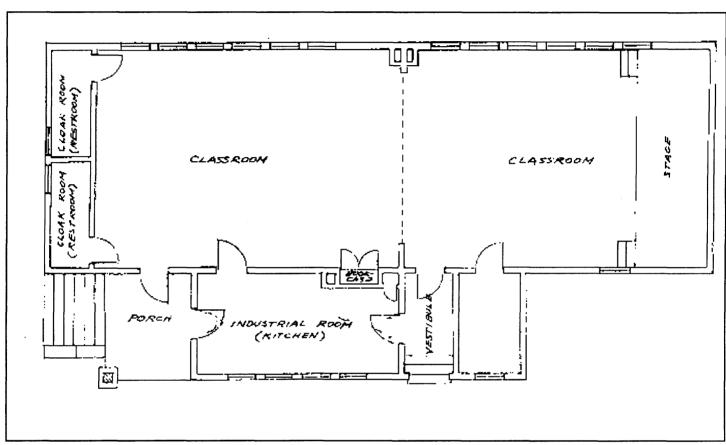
Existing floor plan for the Hiram Colored School, Paulding County, Georgia
